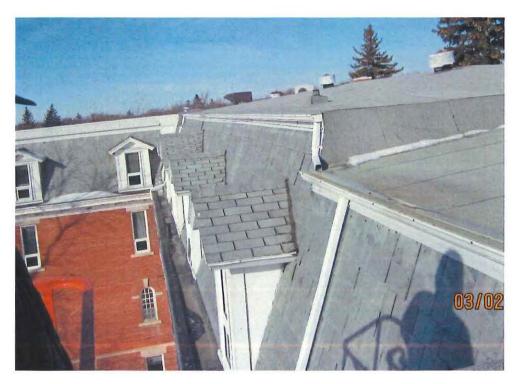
South façade – roof caulk at dormers; missing top row of slates (note asphalt shingles on dormers and no metal flashing)
